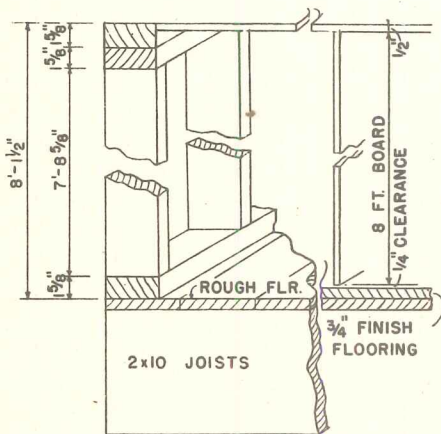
Detail shows relationship between 4 by 8 ft sheet board material and interior wall framing. A 1/4-in. clearance eases installation
